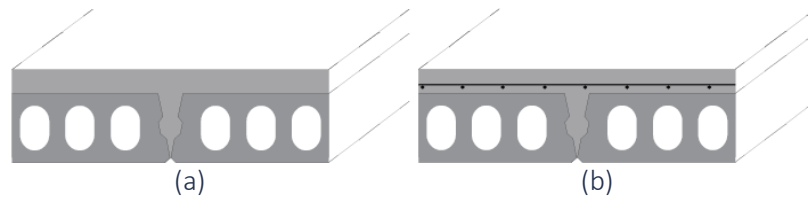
A prestressed hollow-core slab a) with a non-structural layer; b) with a structural layer
